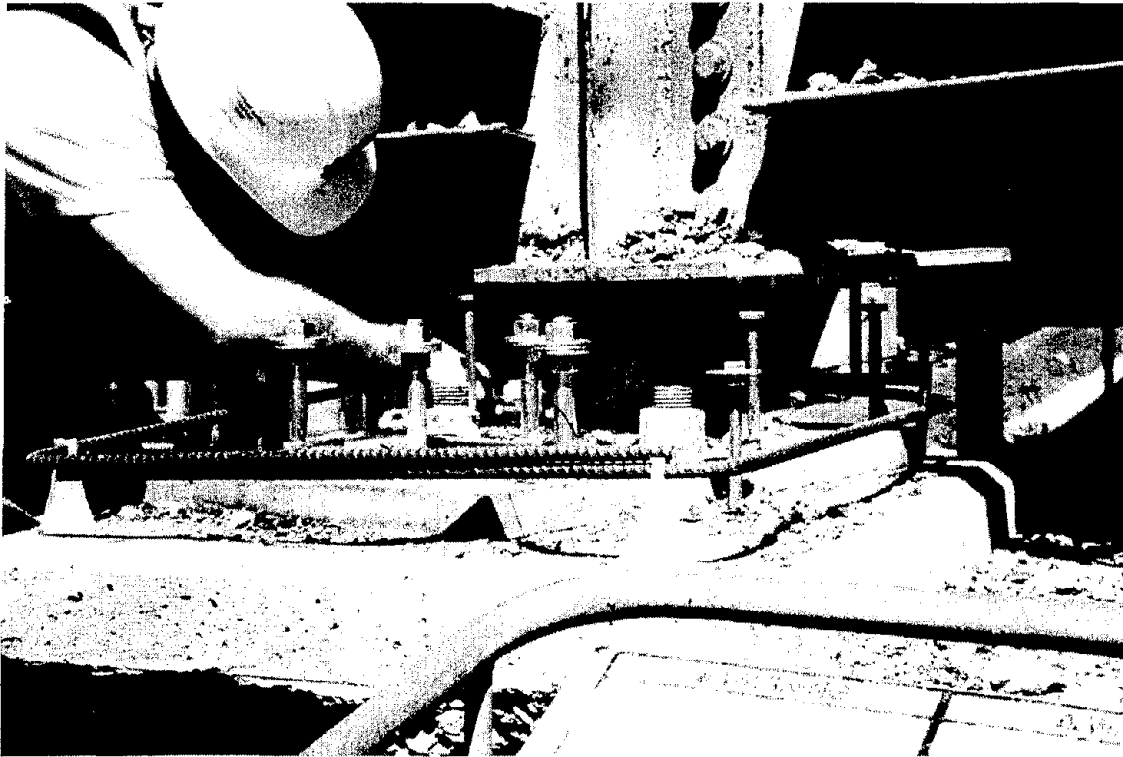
Detail of concrete support on top of Bent #5- Detail "A" in Figure 15
